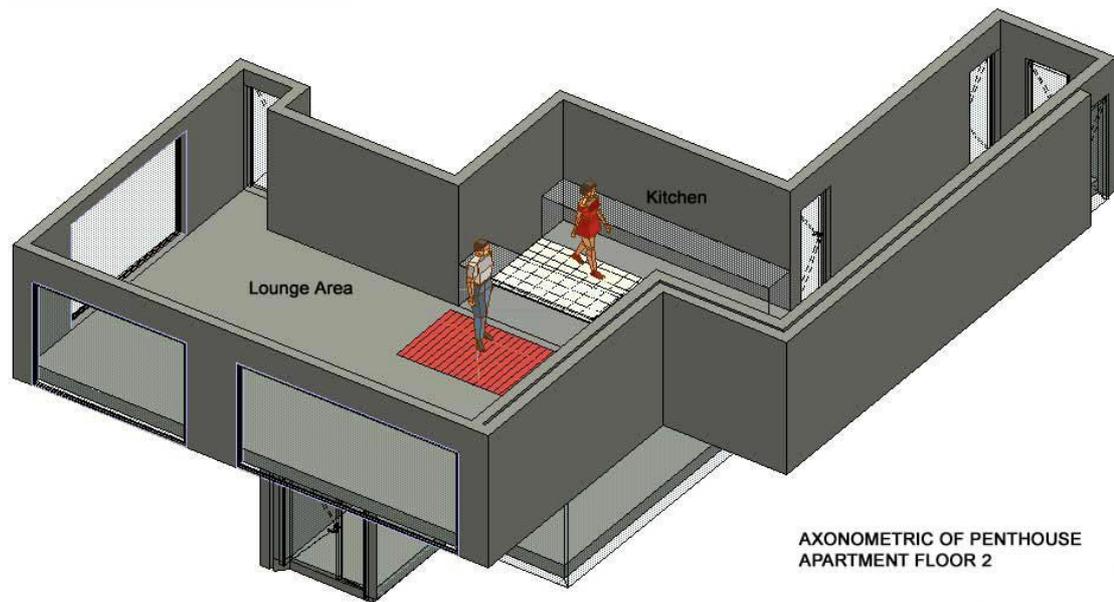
AXONOMETRIC INDICATING PENTHOUSE FLOOR 2 (not to scale)
